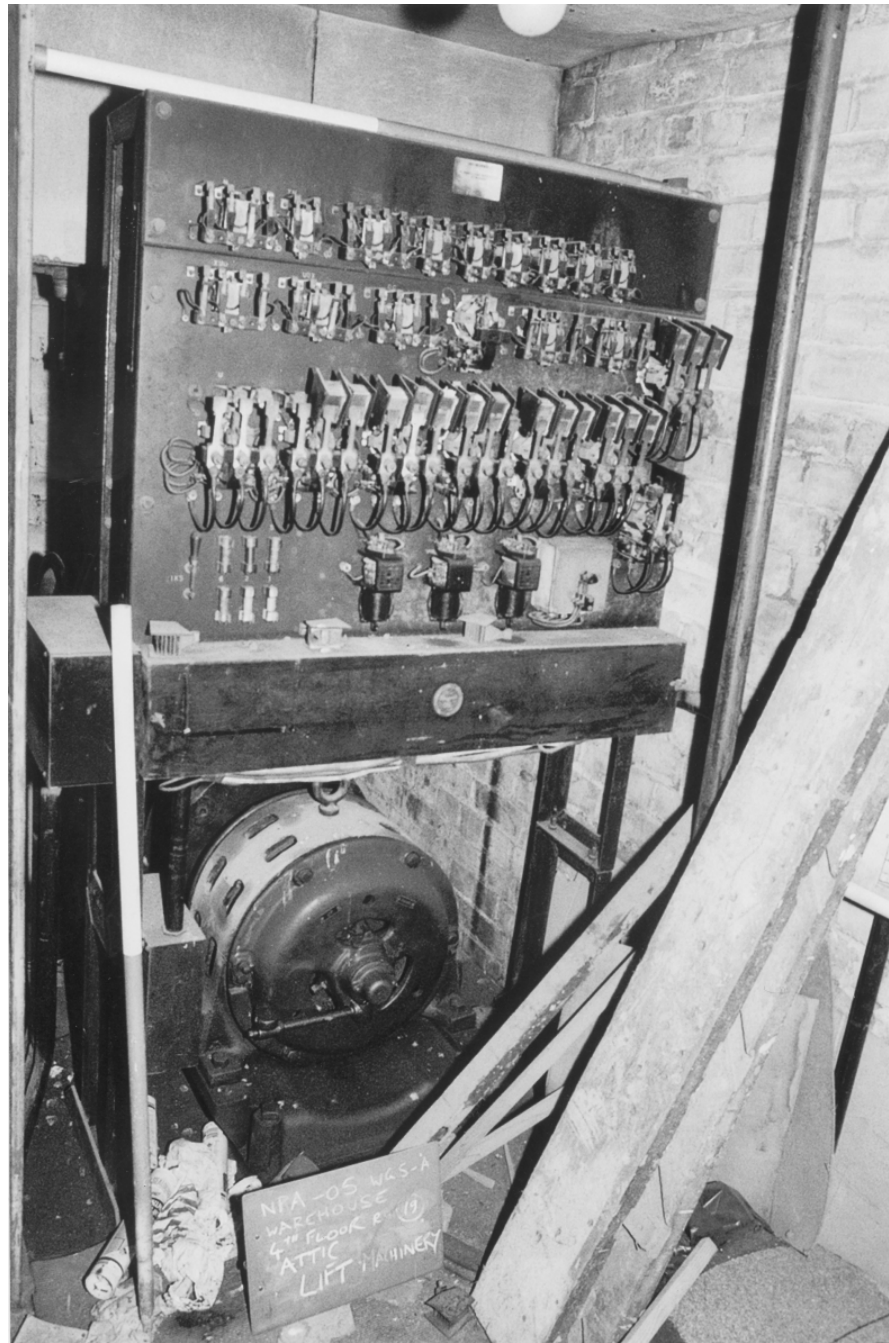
(above): Fourth Floor Attic. Lift machinery, looking west.
